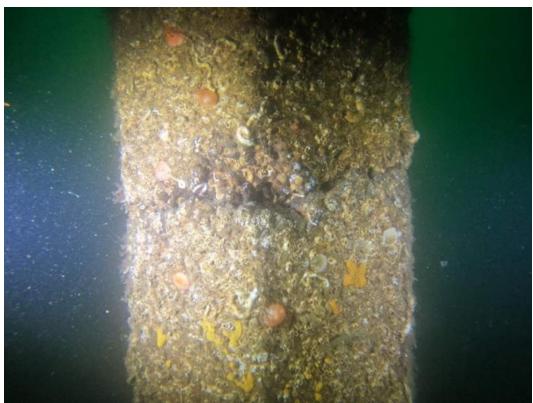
Pile 26:G, Major Tension Crack with Spalling
